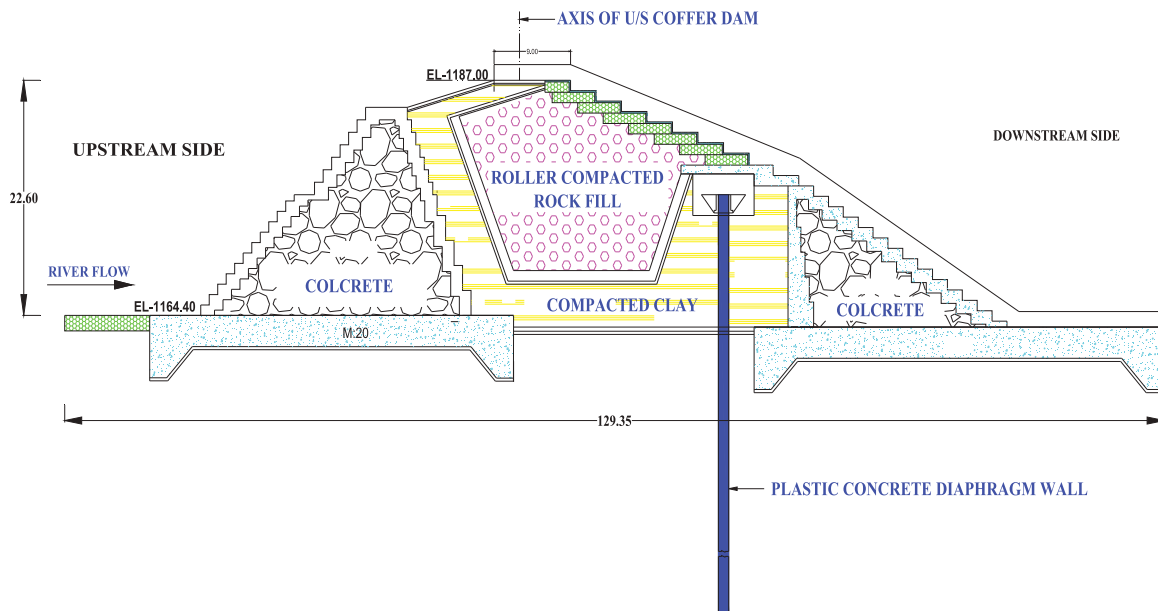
A typical section of U/s coffer dam indicating working platform and cut-off wall
